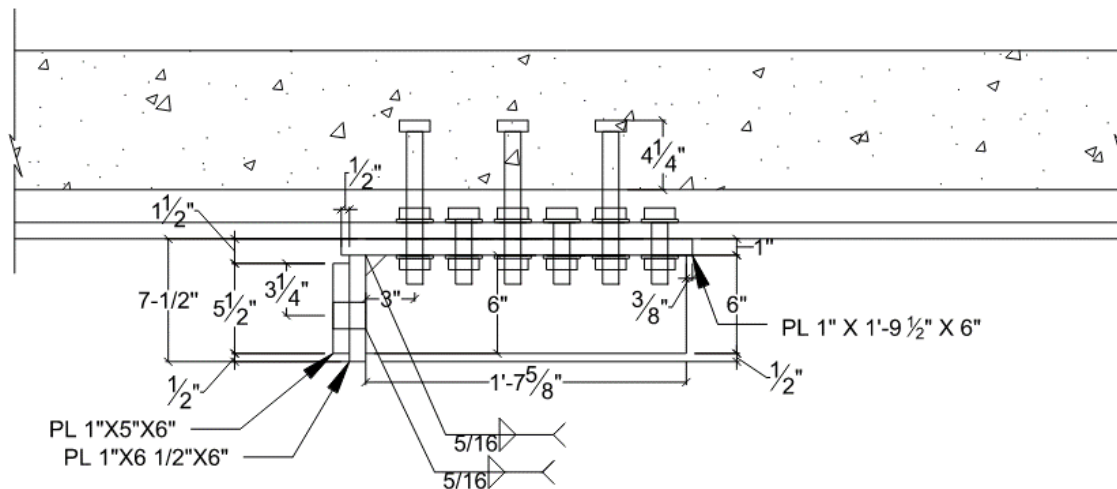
Close-Up Elevation of Steel Bracket Assembly.
